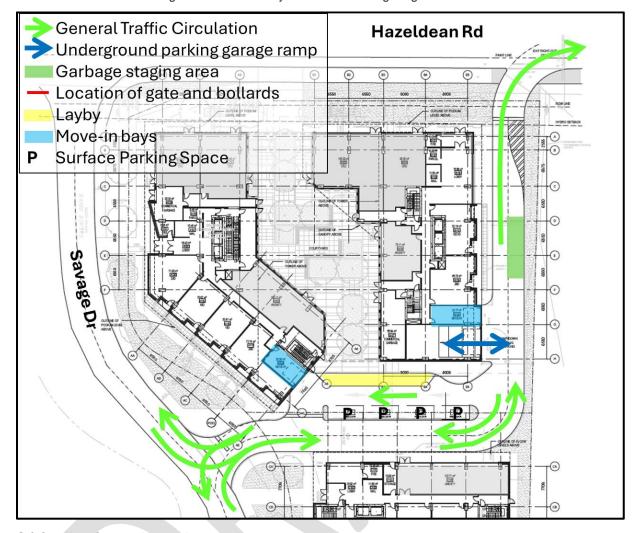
Internal Driveway Circulation and Parking Garage Access Location
